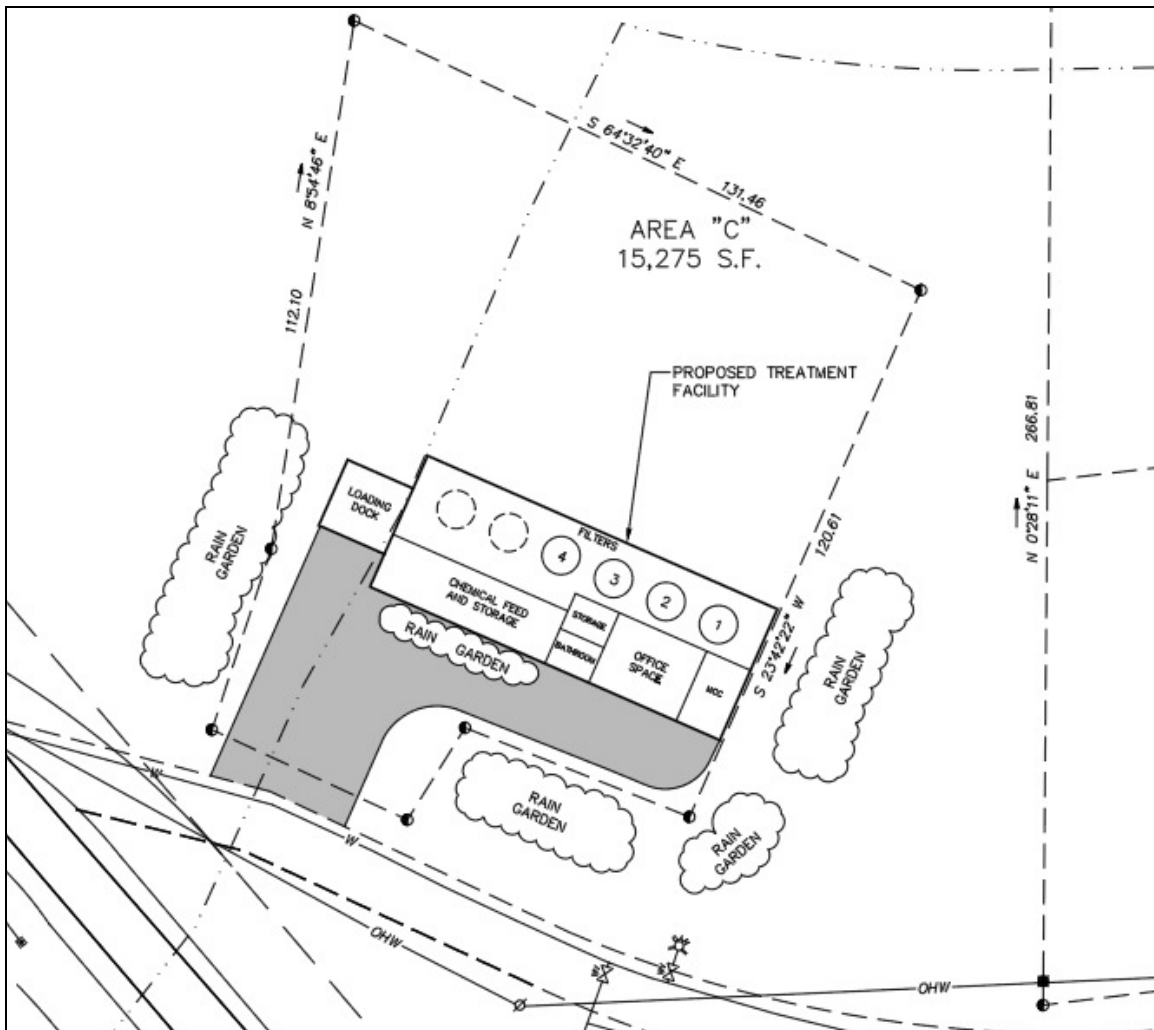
Preliminary Site Layout of Groundwater Treatment Facility at Gilman Park
